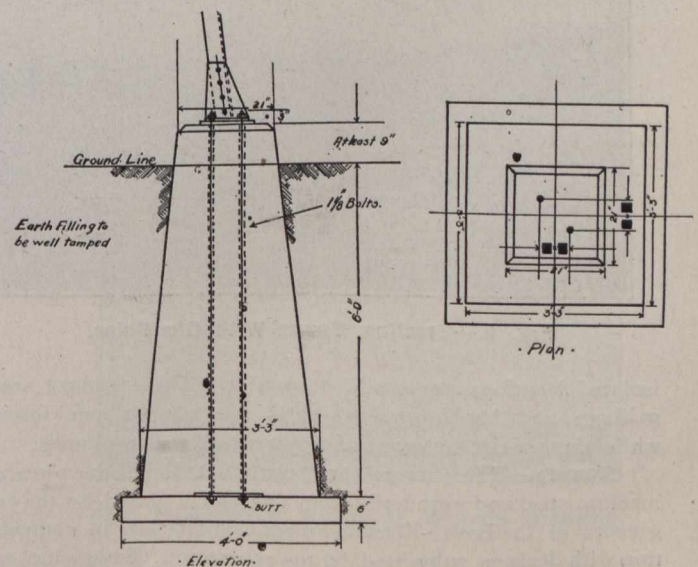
Concrete Footings for Heavy Anchor Tower.
